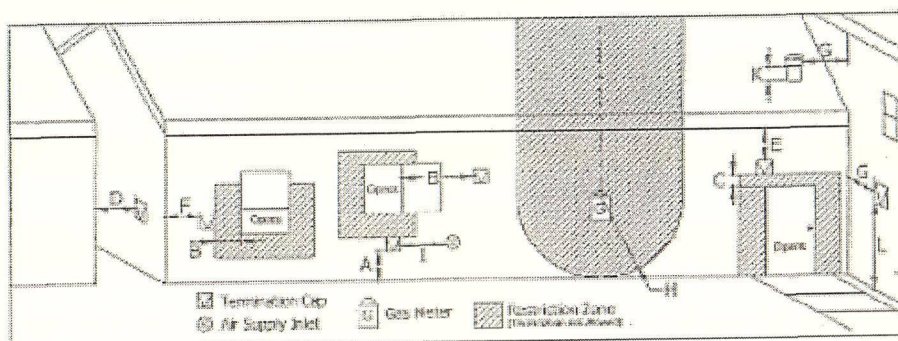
Use in conjunction with Table 1 for allowable exterior vent termination locations
